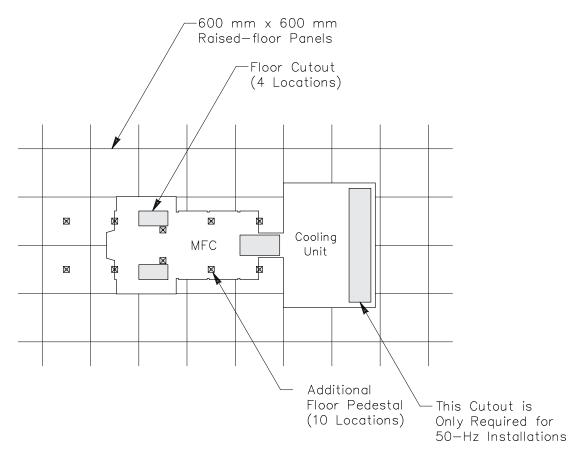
CRAY T3D MCA Floor Plan on 600 mm x 600 mm Floor Panels
